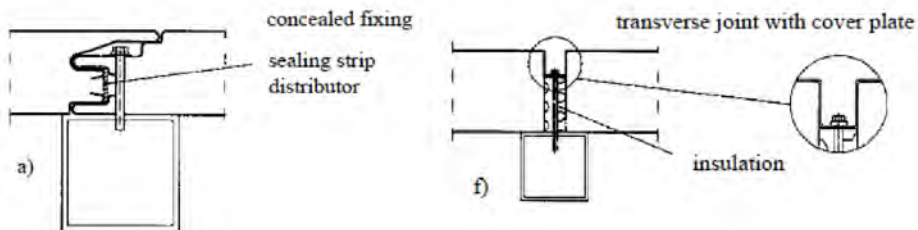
Example of concealed fastenings placed in the longitudinal joints and in the transverse joints of sandwich panels /12/
